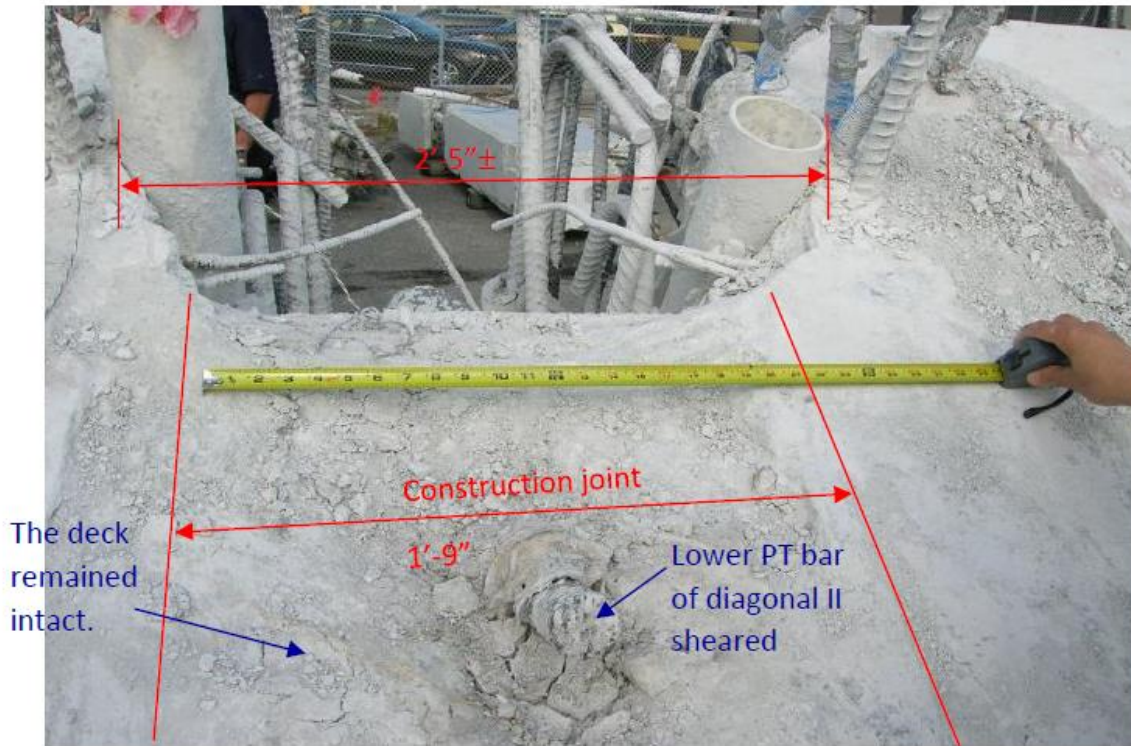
Construction joint below Member 11. (North is upward in the photograph.)
